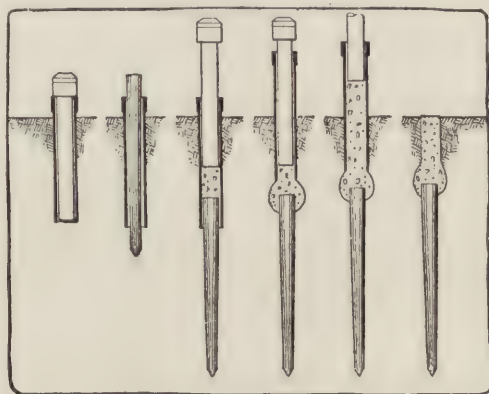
Composite Type, MacArthur Concrete Pile.
